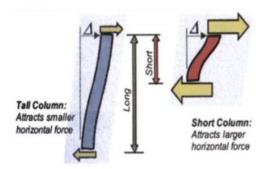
Structural Behavior of Short Column under Lateral Load (Parikh & Shaligram, 2019).
